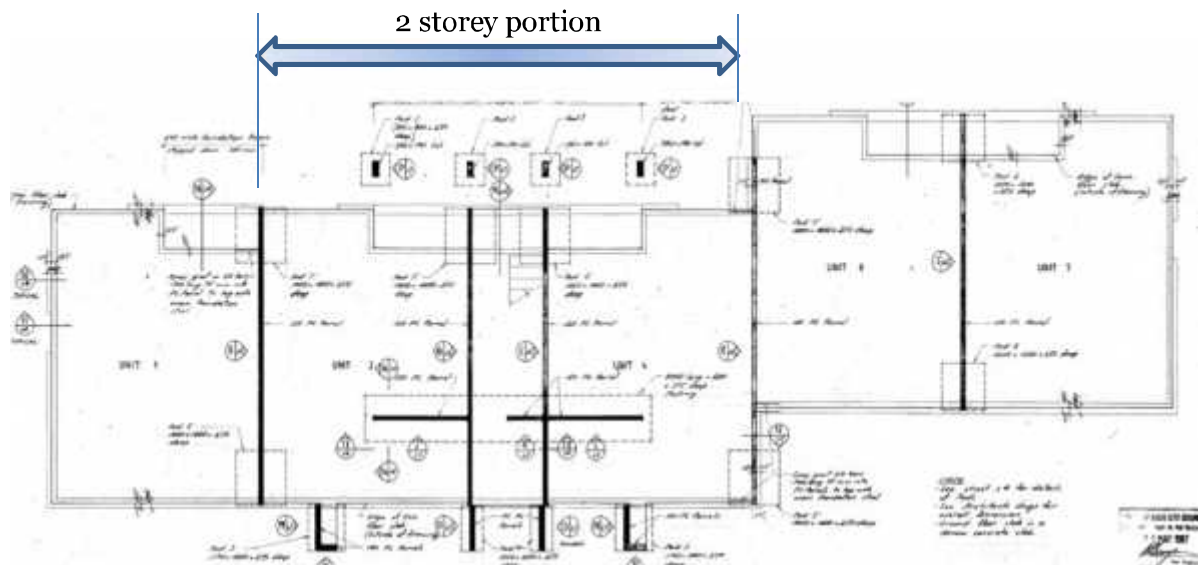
circa 1987 foundation plan for units 1 – 7, typical across the site (original).
